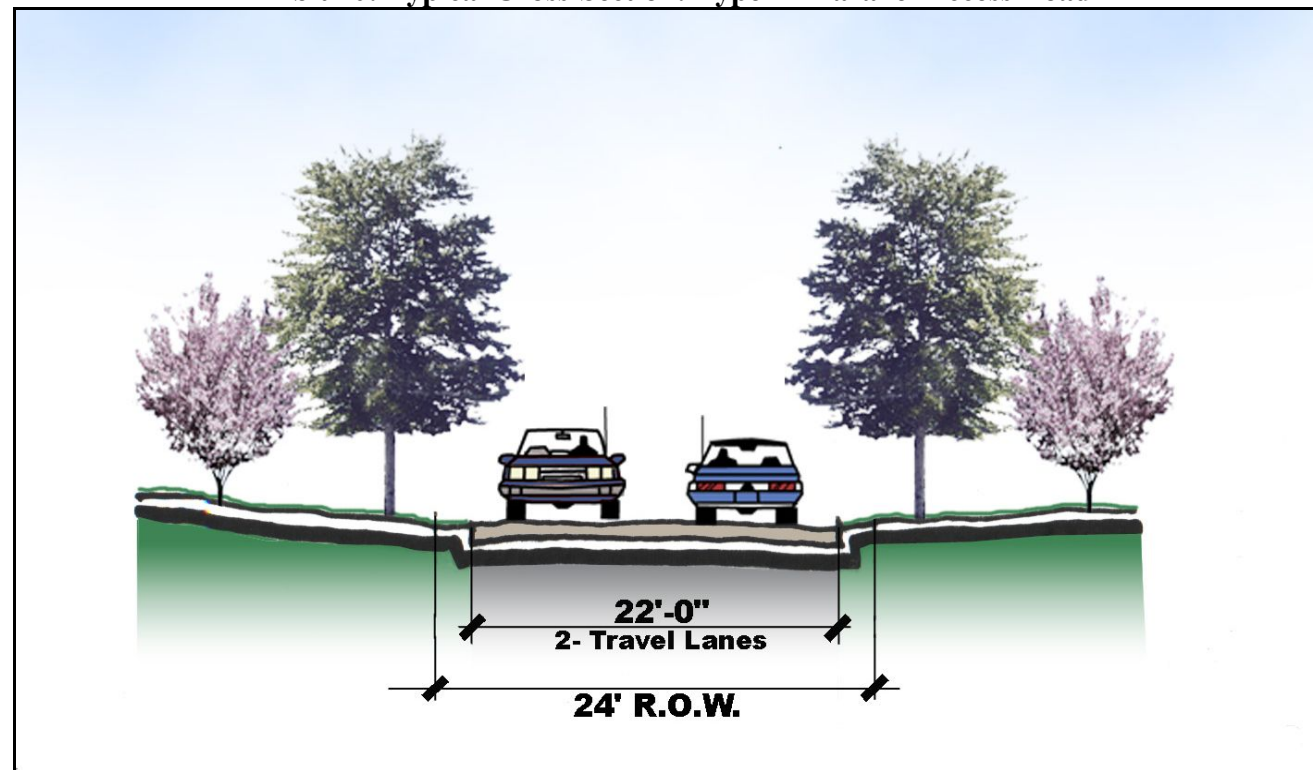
Typical Cross-Section: Type III Parallel Access Road
